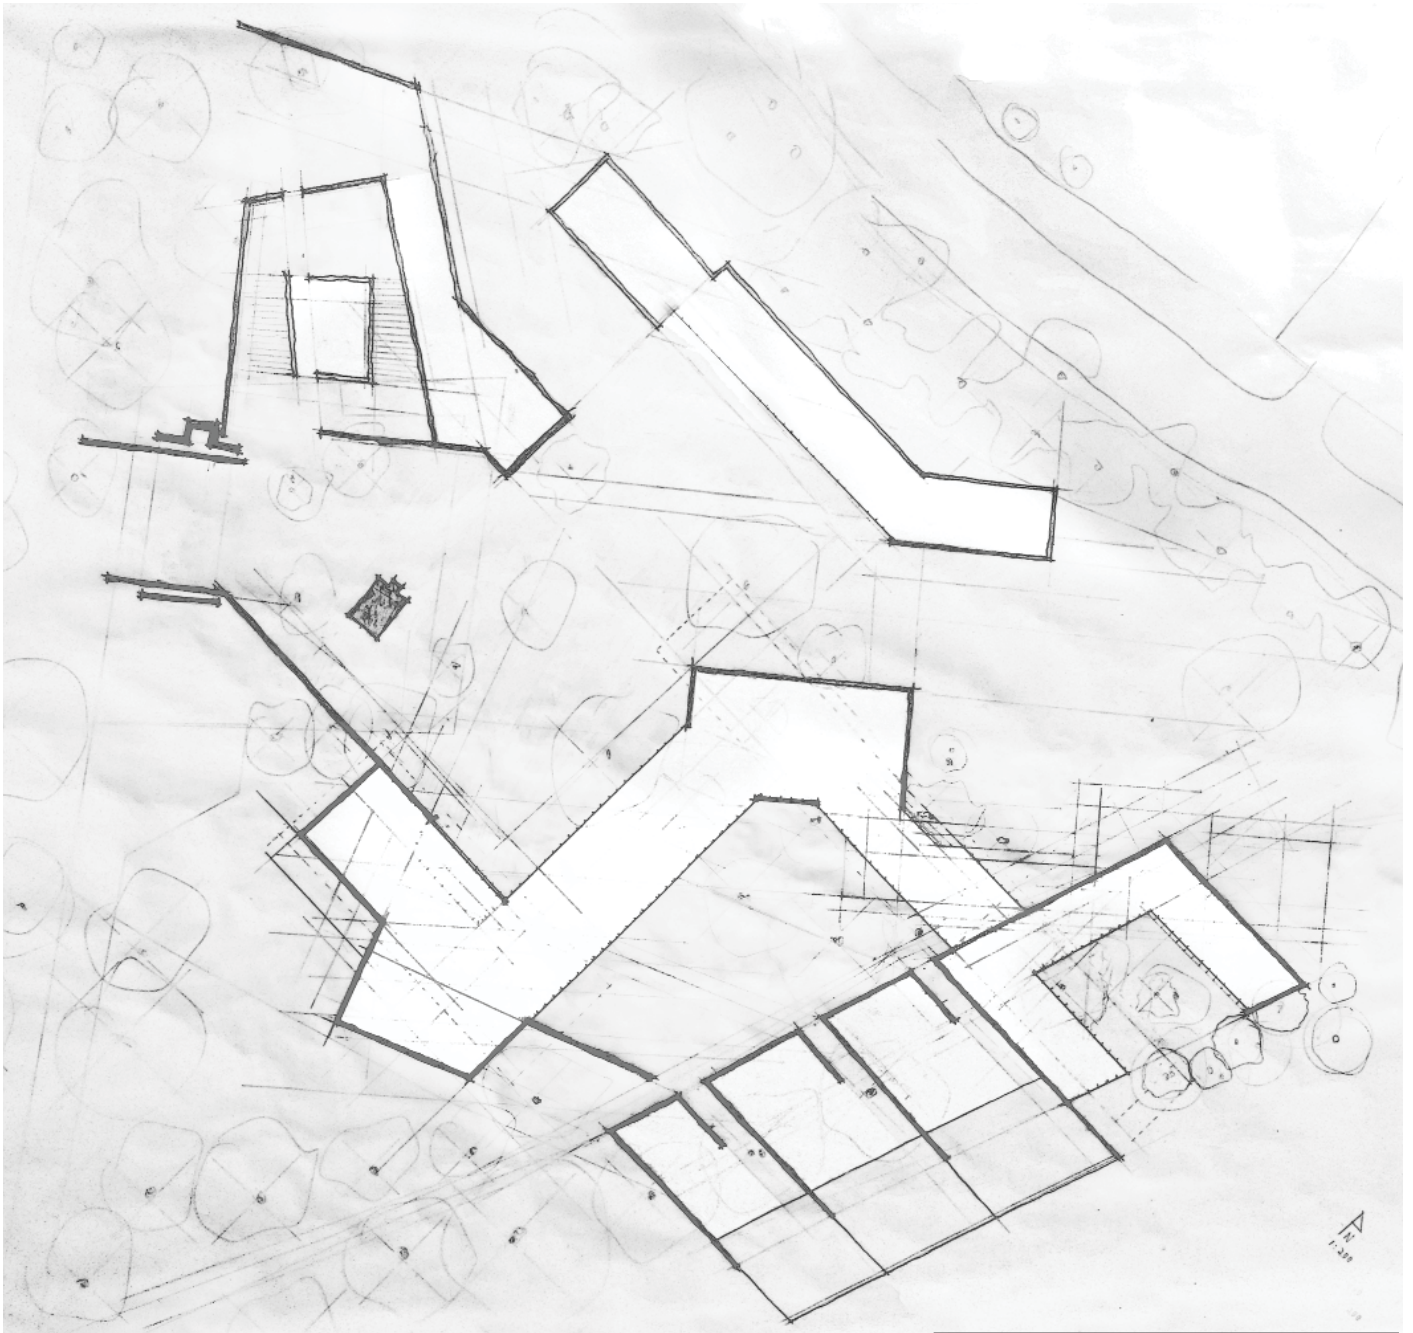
Finding The Right Angles For Final Building Plan (Author)
